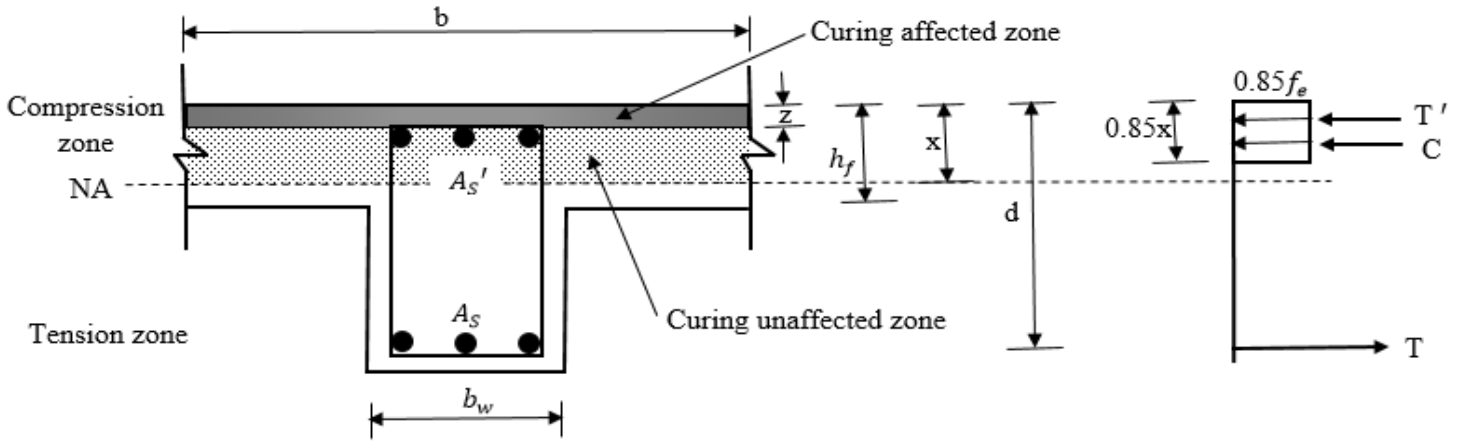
Cross-sectional view of T-section doubly reinforced beam (NA within flange)
